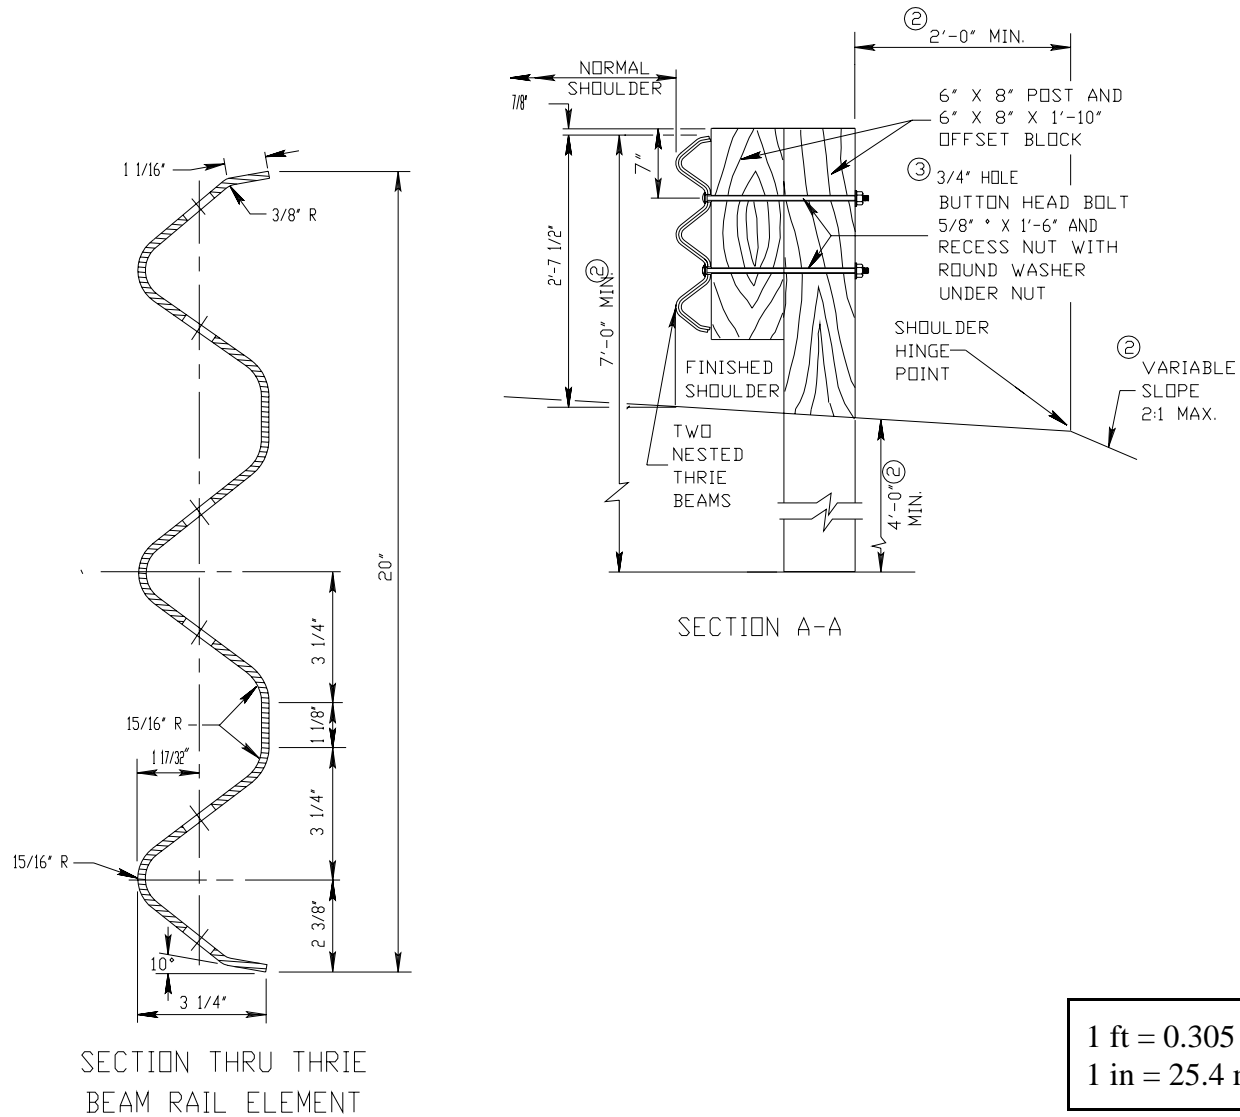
Details of the thrie beam transition approach—beam and post detail.
